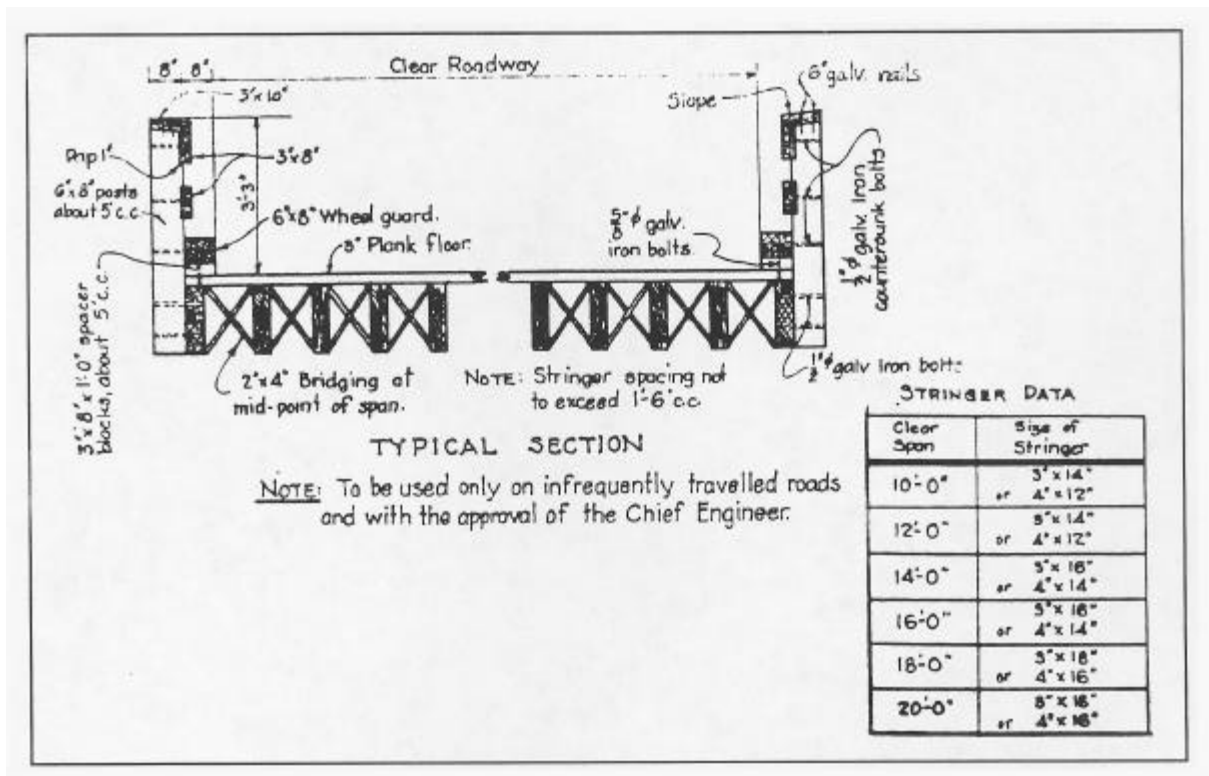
Timber Bridge from Standard Plans of 1933 (Source: Maryland State Roads Commission 1933).
